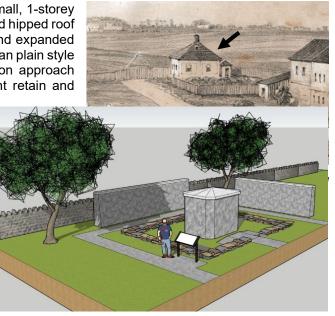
A 3D model providing a conceptual example of how the 1846 stone foundations and the northern stone masonry wall can be sensitively incorporated into the design of a new columbarium. <u>Note:</u> Conceptual only; not a final design proposal.
